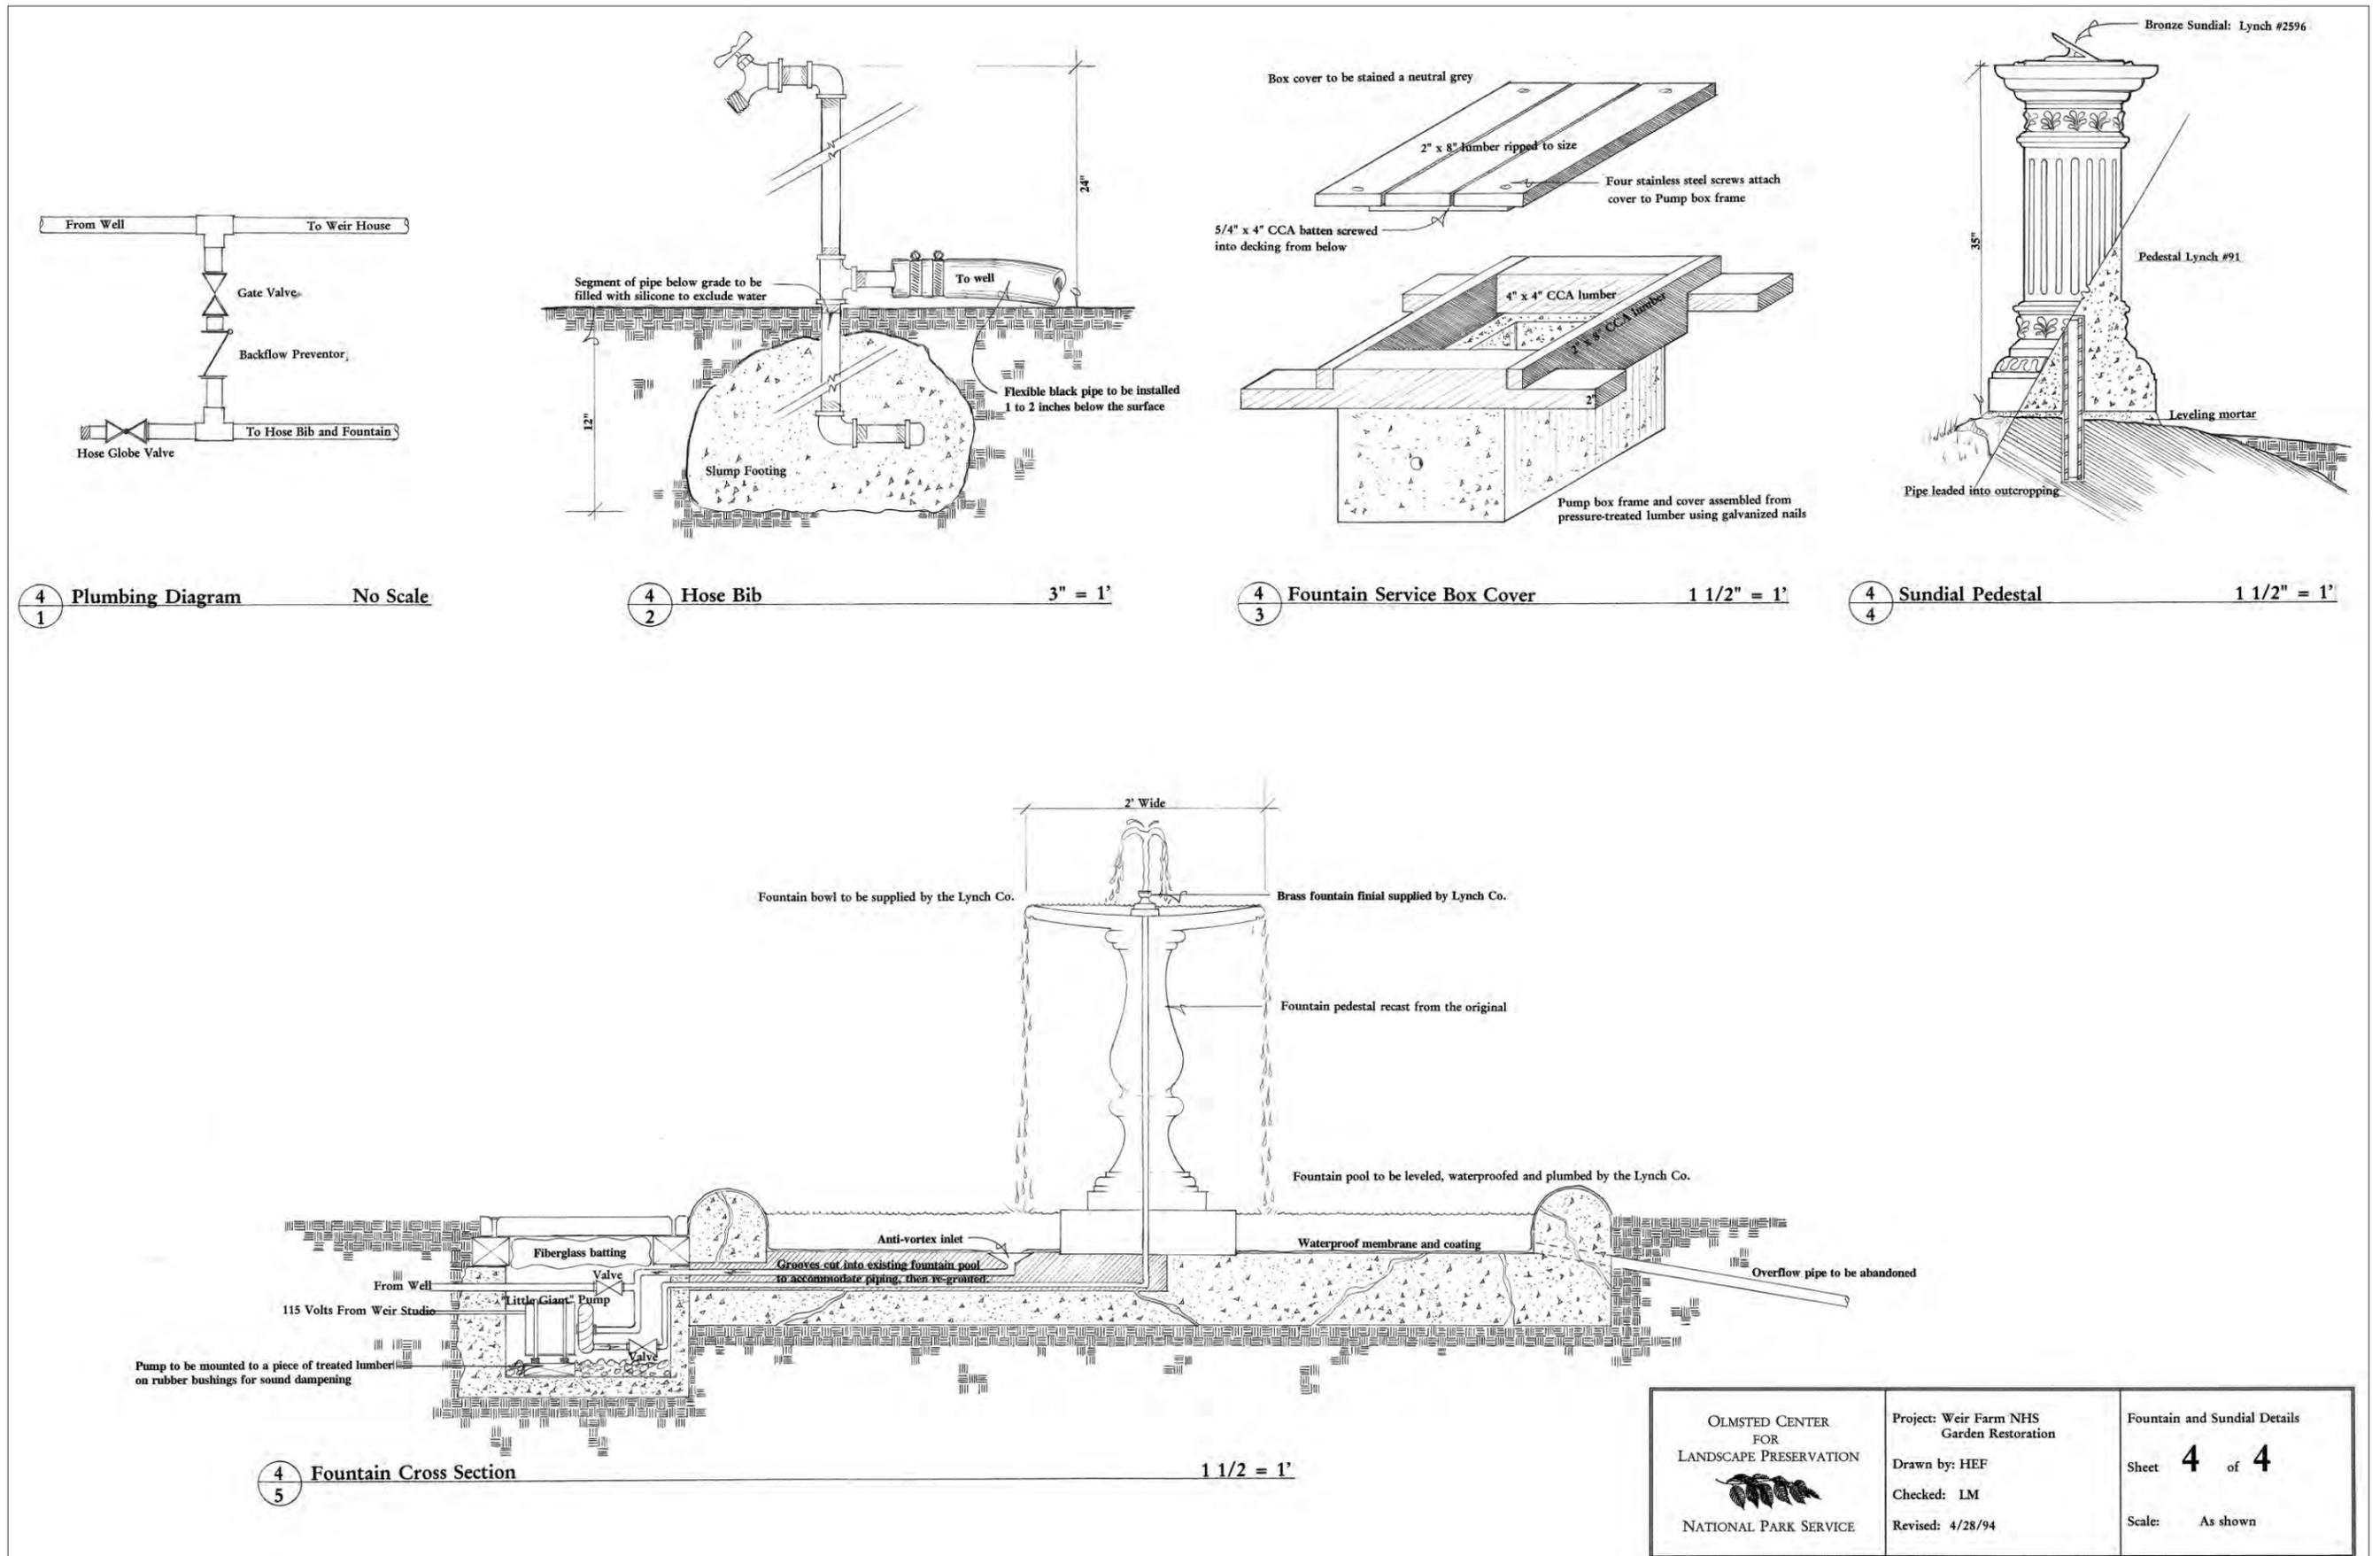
Secret Garden fountain and sundial details (OCLP, 1994).
